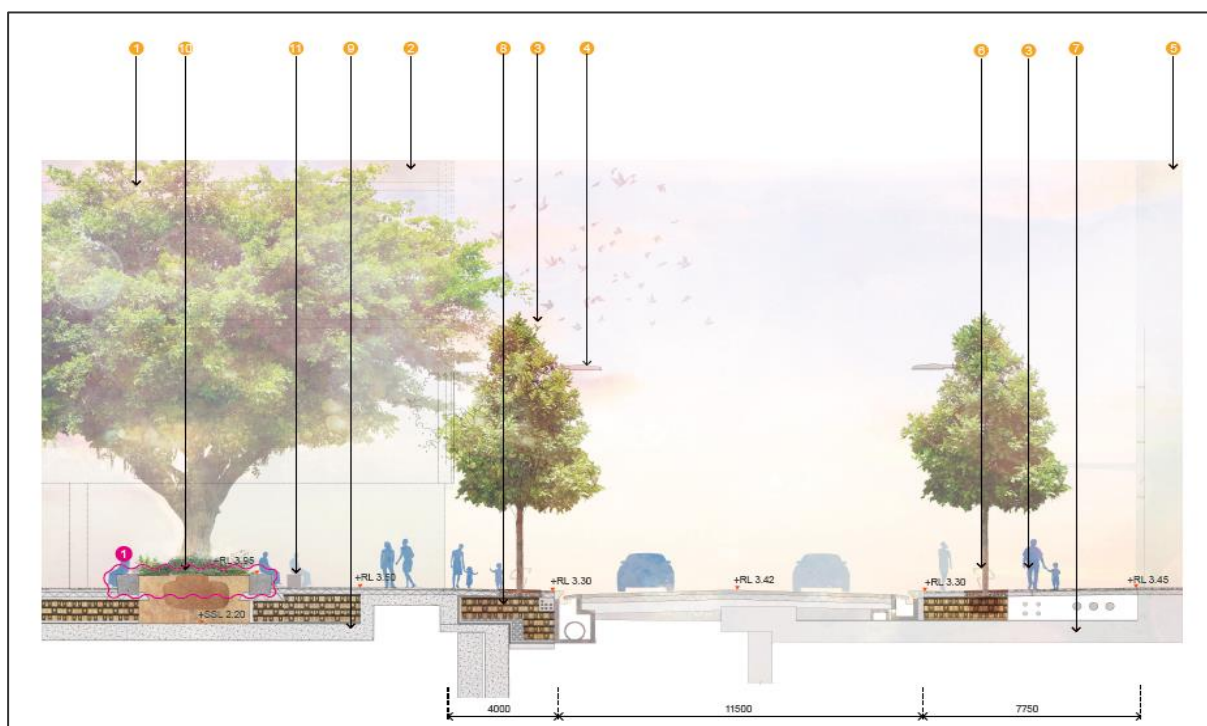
| Proposed removal of timber seating from raised planter in Watermans Quay identified as 1 (Source: Applicant)
